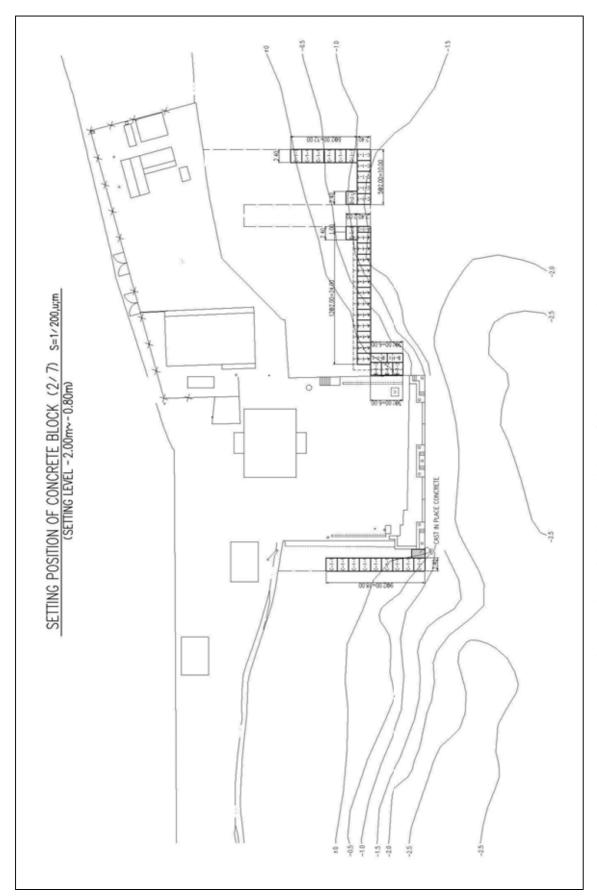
Setting Position of Concrete Block 2nd Layer
